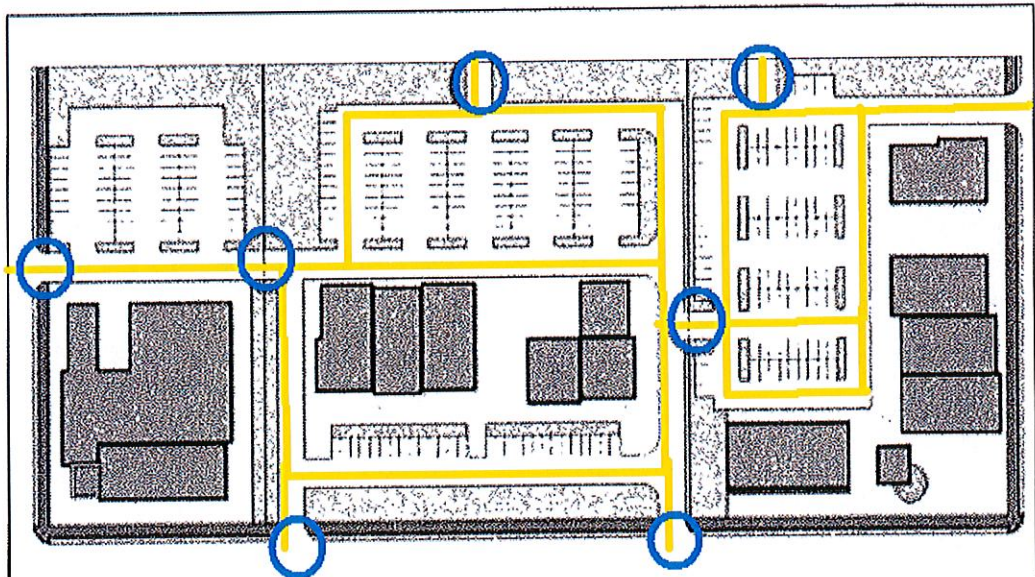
Cross-access between parking areas and adjoining developments. Joint access through the utilization of common driveways between developments.
